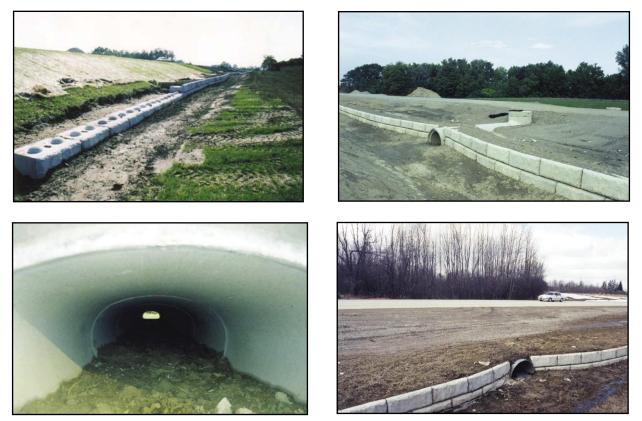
Bayview Avenue Extension–Examples of Amphibian Tunnel Construction, Interior, and Finished Look
